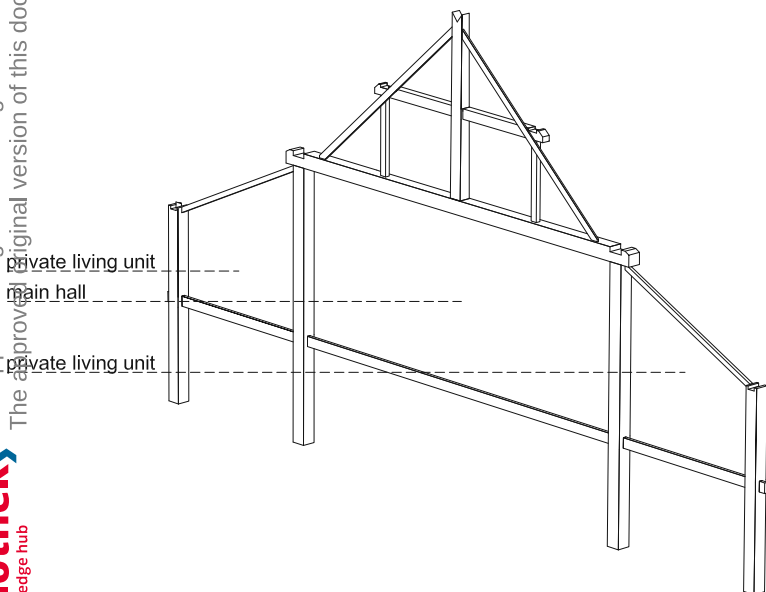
Typical transverse frame of a long house in Baan Ngek village
